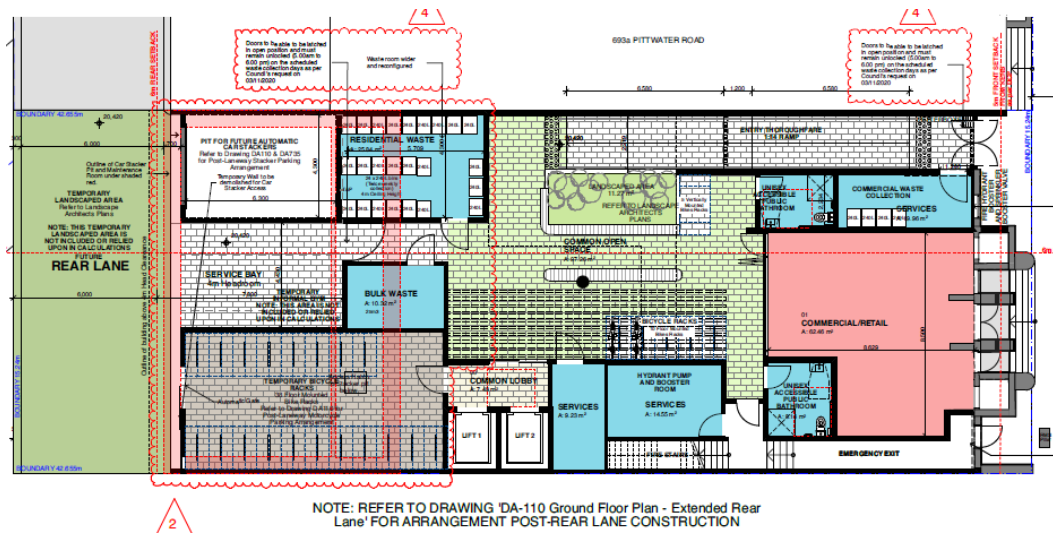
Revision G Ground Floor plan – Interim (DA 100)
